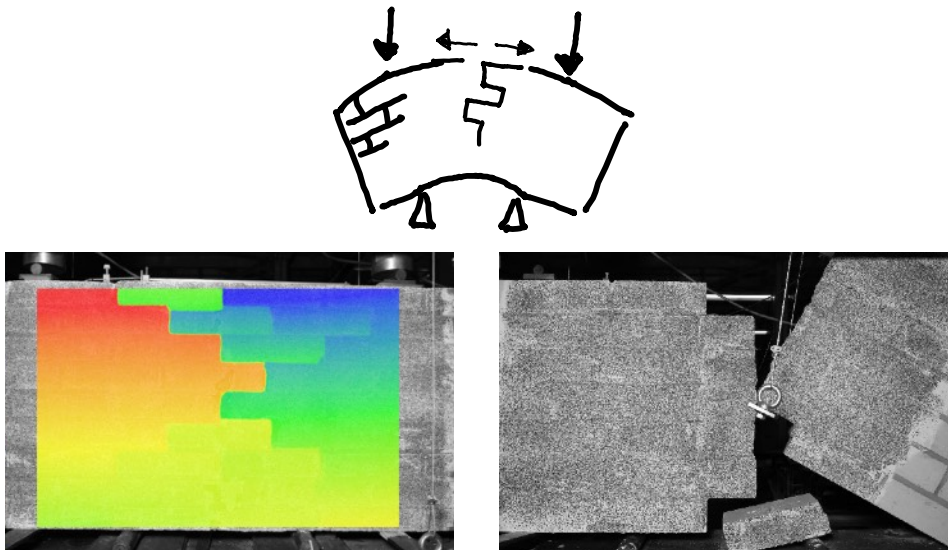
Spandrel specimen 2B, fired-clay with toothed crack revealed by DIC output; and sample 2a, calcium-silicate brick masonry with brittle, brick-splitting vertical crack.
